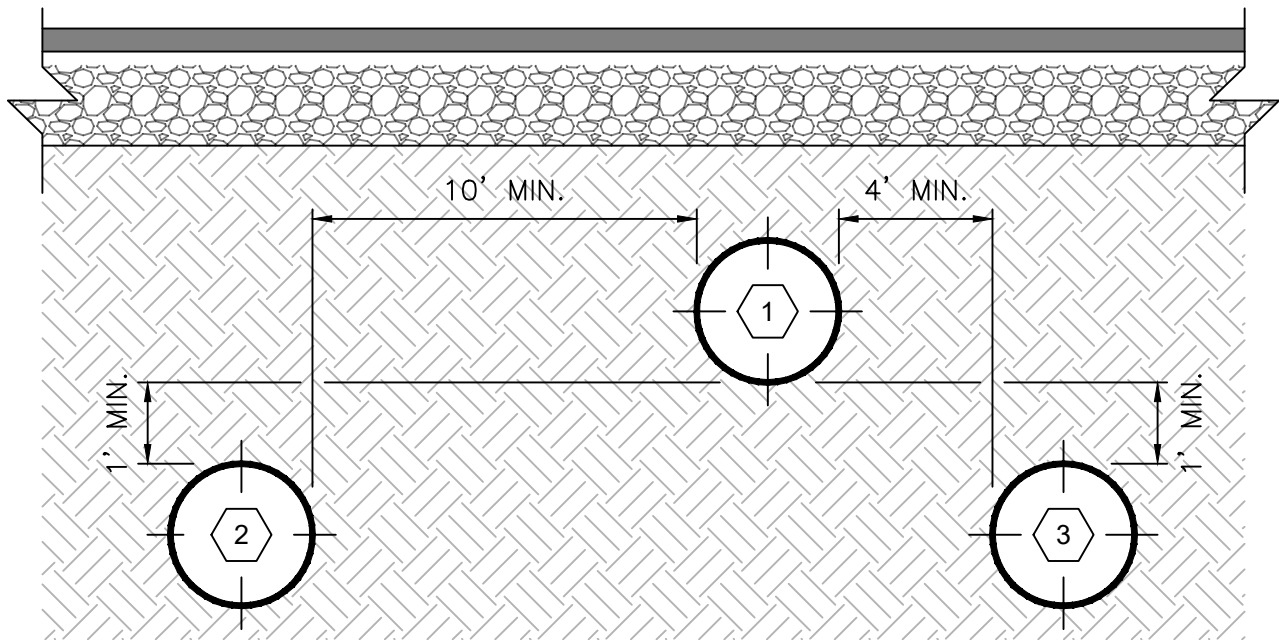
MINIMUM SEPARATION STANDARDS FOR PARALLEL CONSTRUCTION OF NEW WATER PIPES
